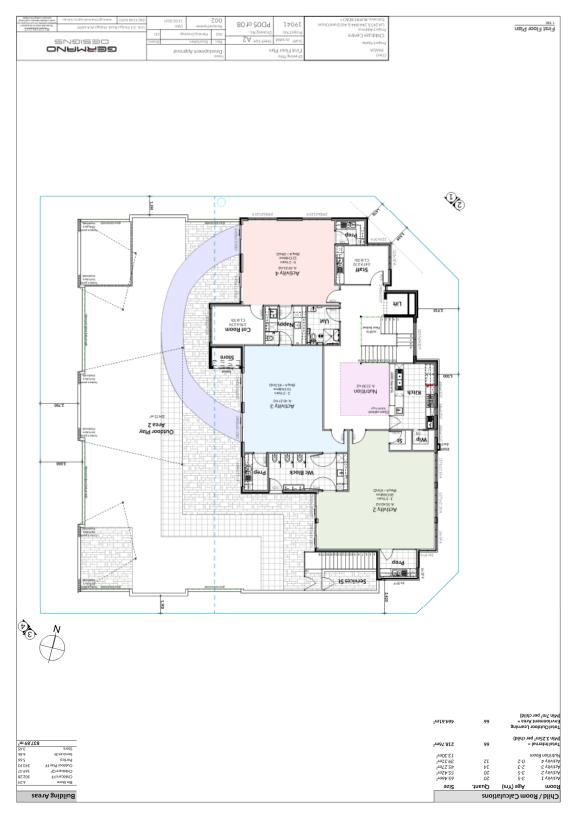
FIRST FLOOR PLAN (drawing rotated to shown North at top of page)
